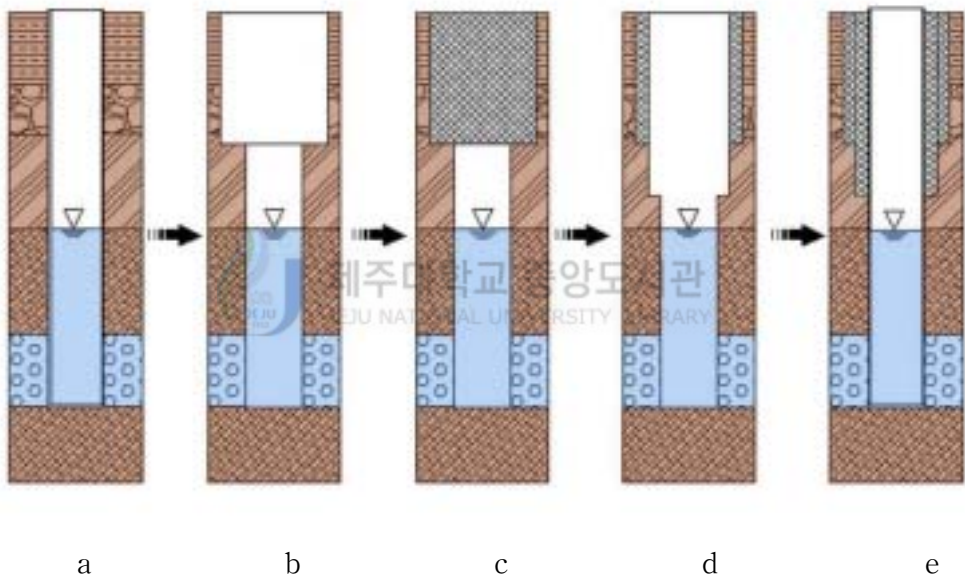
Diagram of filling-grouting technique(a:before repairing, b:widening a well, c:filling-grouting d:reexcavation, e:grouting of surrounding gap)
